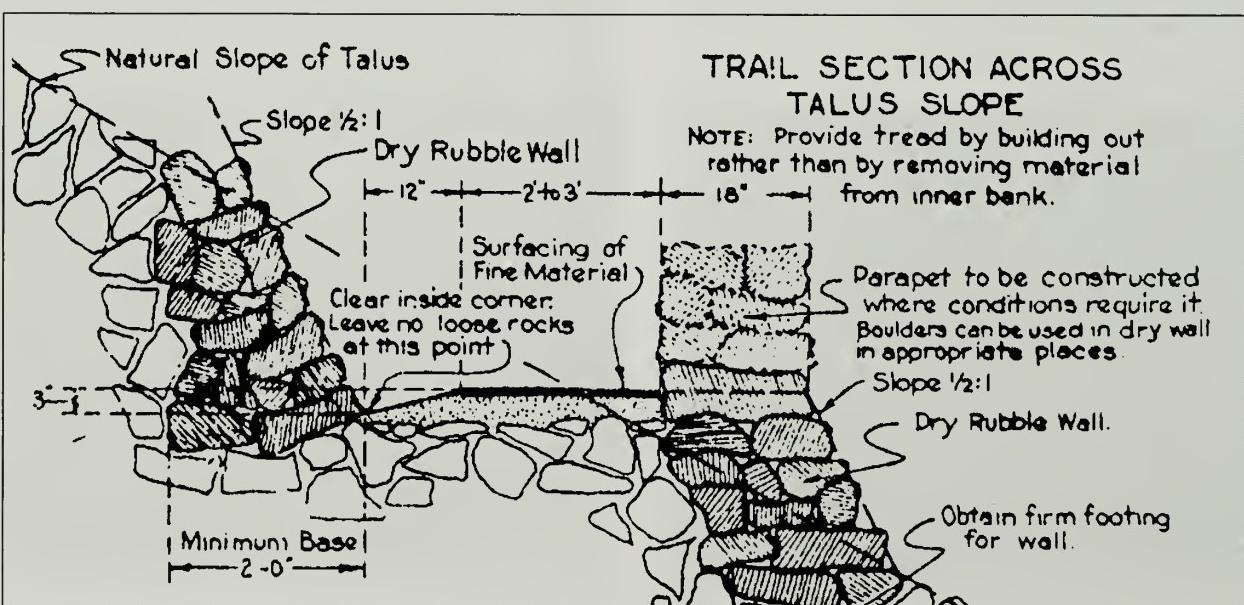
CCC specifications for rubble retaining walls on bench construction.
